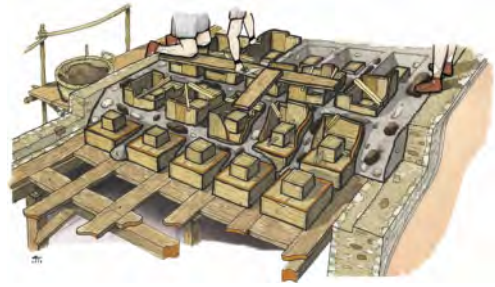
Reconstruction of the floor's construction system (area 45: formwork system (Antoine Louis)).
